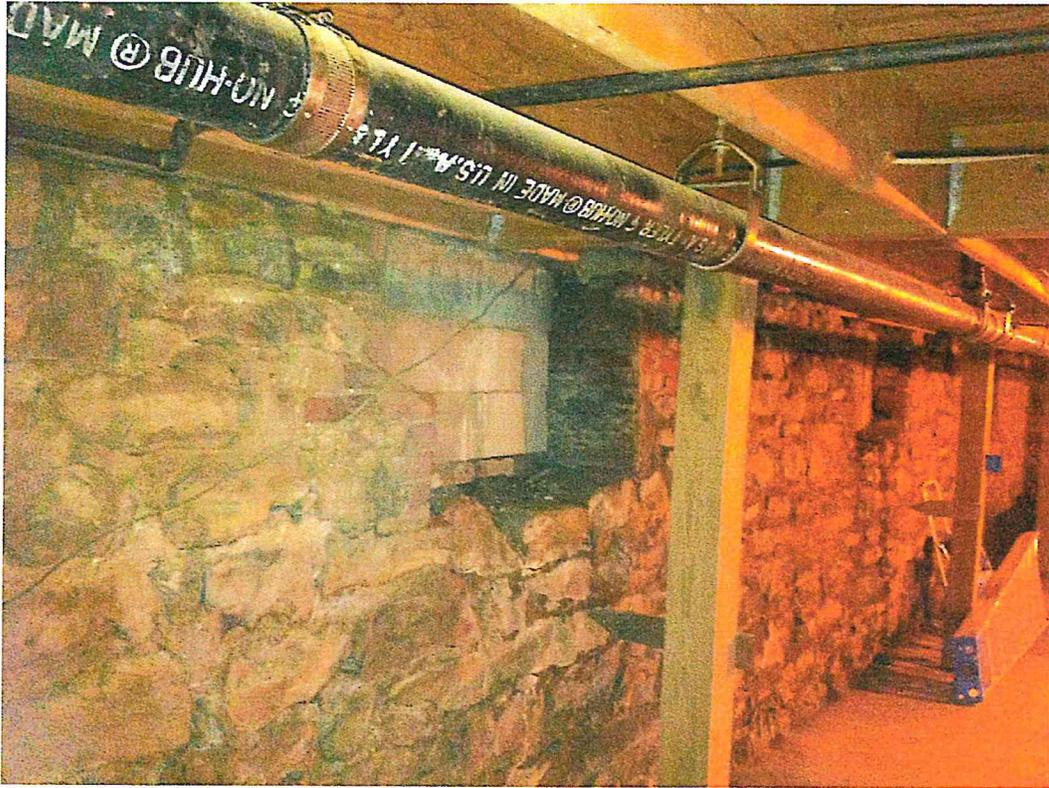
North wall of cellar, showing infill of windows buried in 1928. Locations of these windows will be duplicated in the new Ground Floor walls that will be inserted between these existing walls that will remain and the raised walls of the first and second floors.
